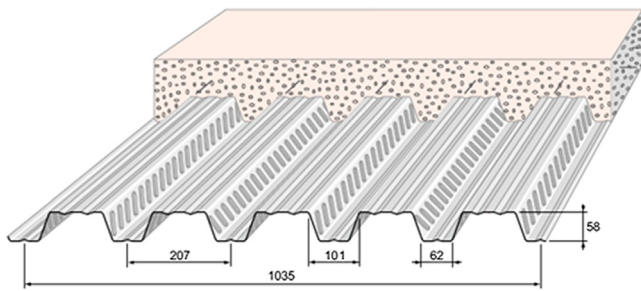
Trapezoidal steel deck in composite floor slab [19].
